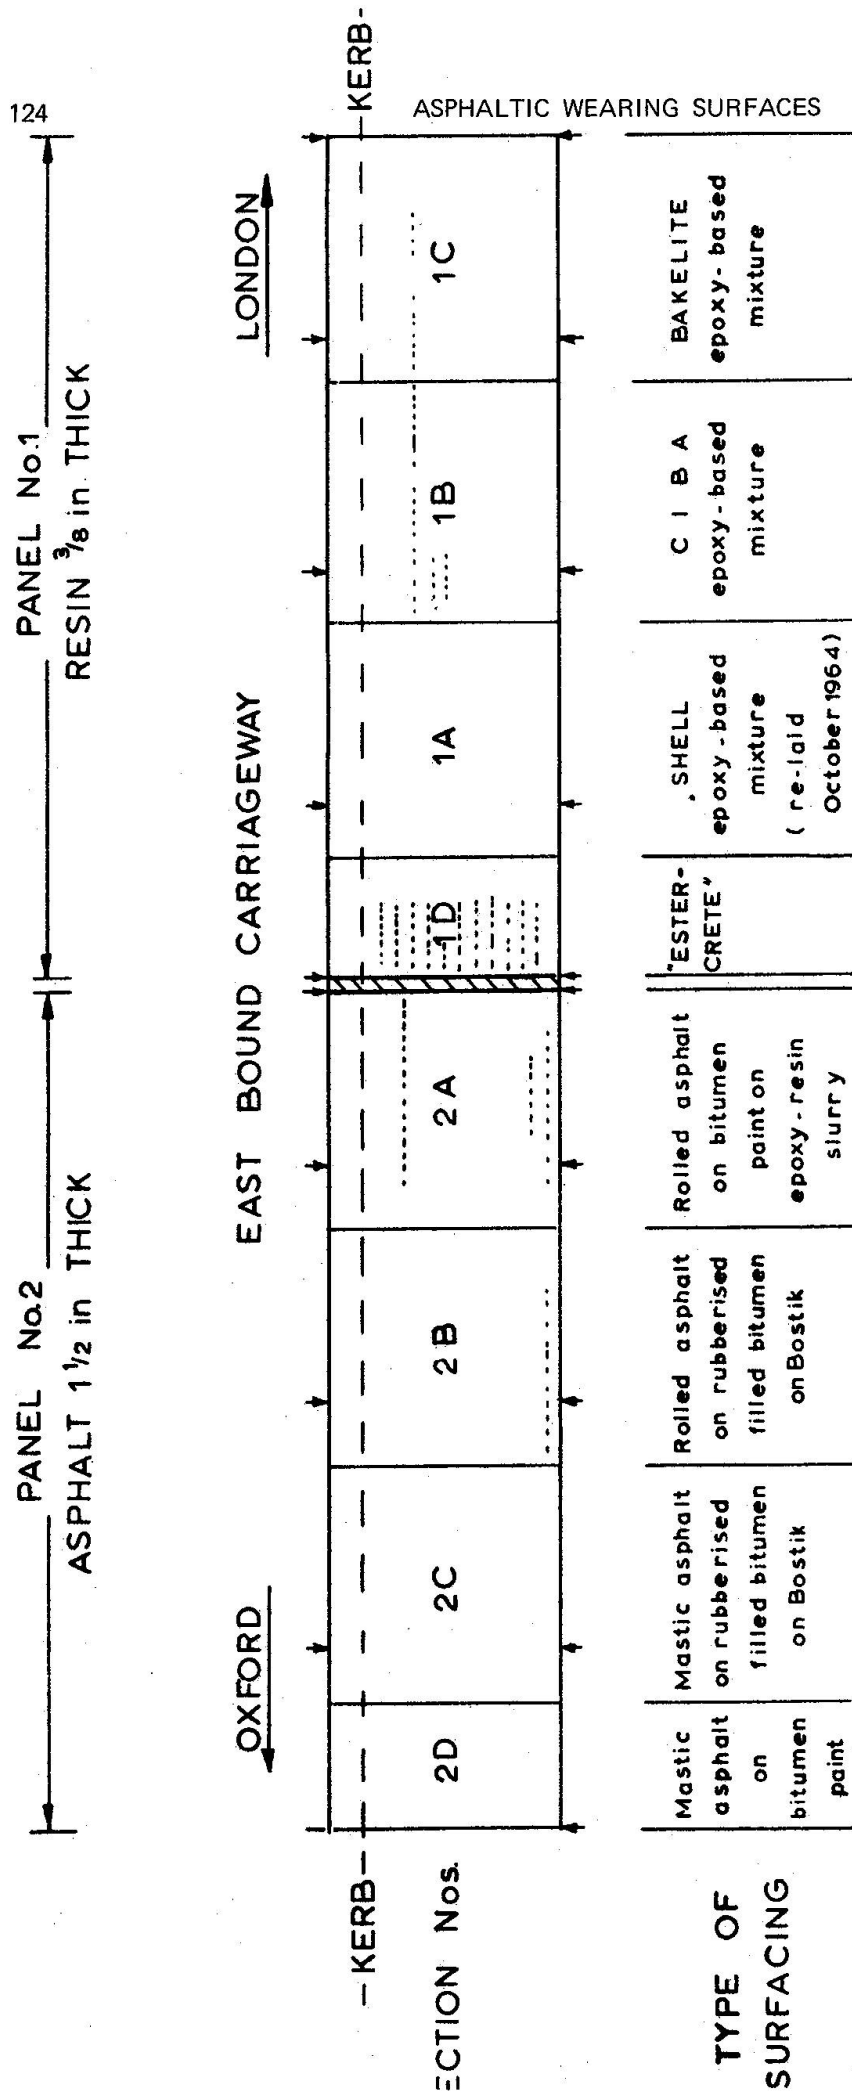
DETAILS OF DECK PANELS INSTALLED ON TEST SITE
